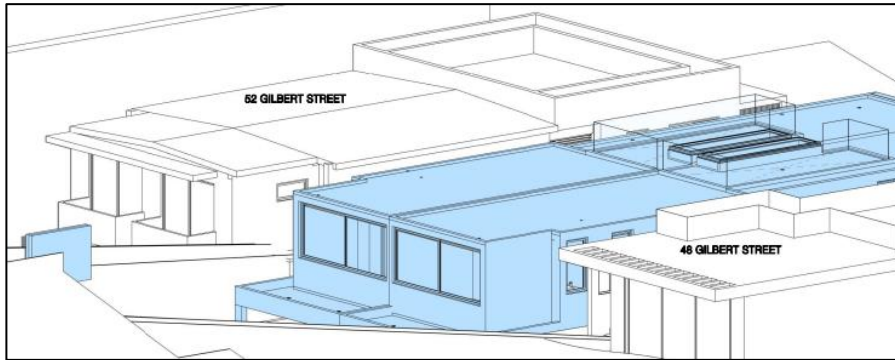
Proposed 9am sun's eye diagram overshadowing 52 Gilbert St.
